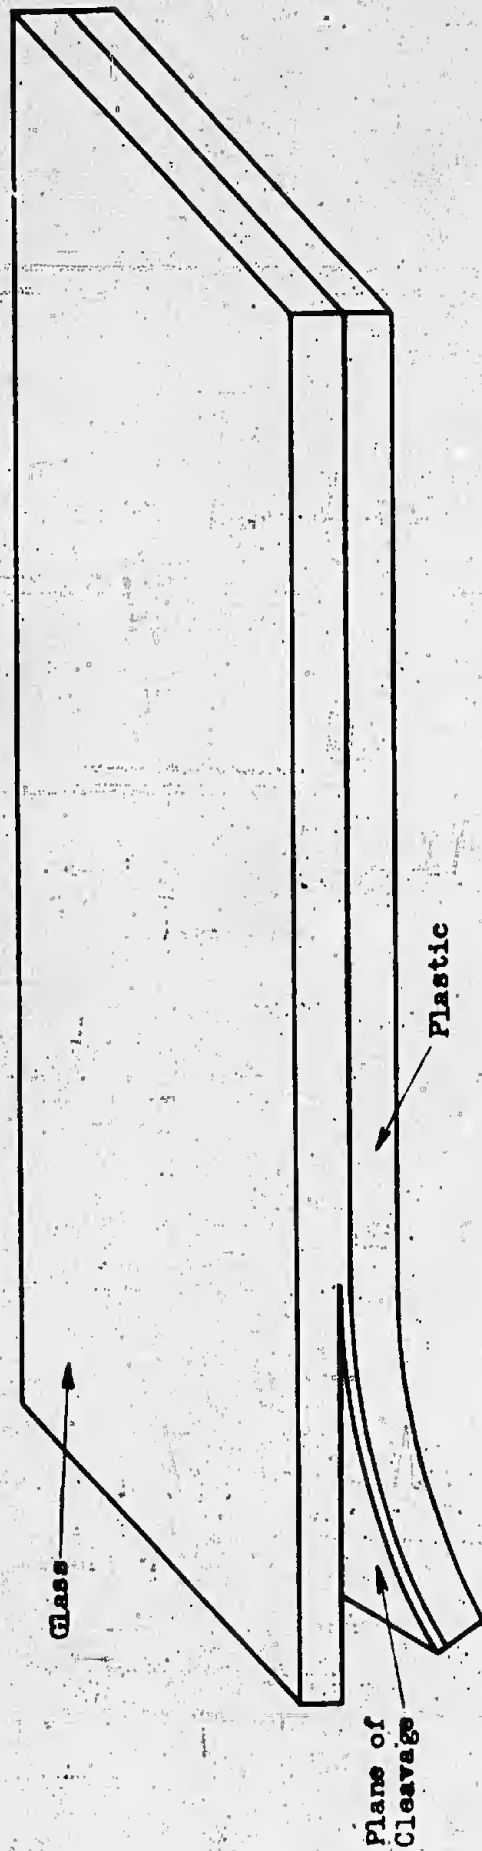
SKETCH OF BEAM (SPECIMEN No. 2) SHOWING PLANE OF CLEAVAGE
